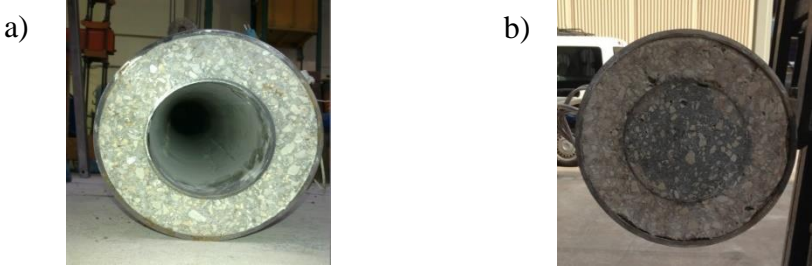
Different types of concrete-filled dual steel tube sections: a) double-skin section; b) double-tube section [28].
